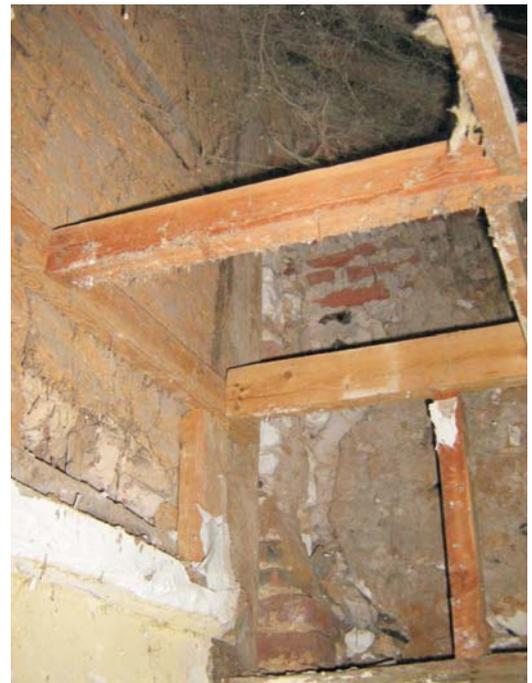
The east end wall of the outshot shows much modification and patching to the construction
